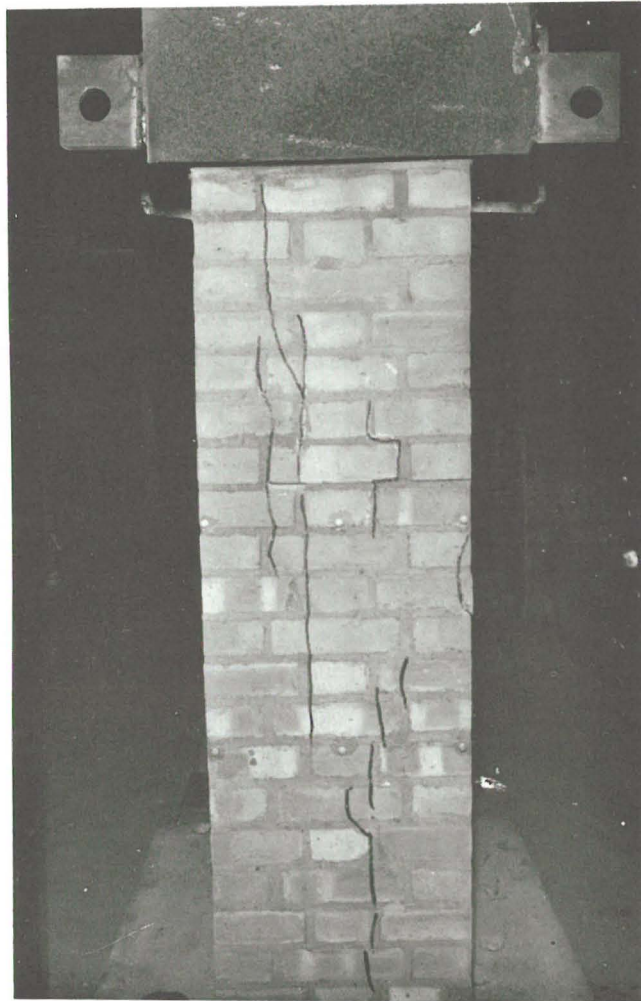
Showing the cracks in the flange on either side of the web.
